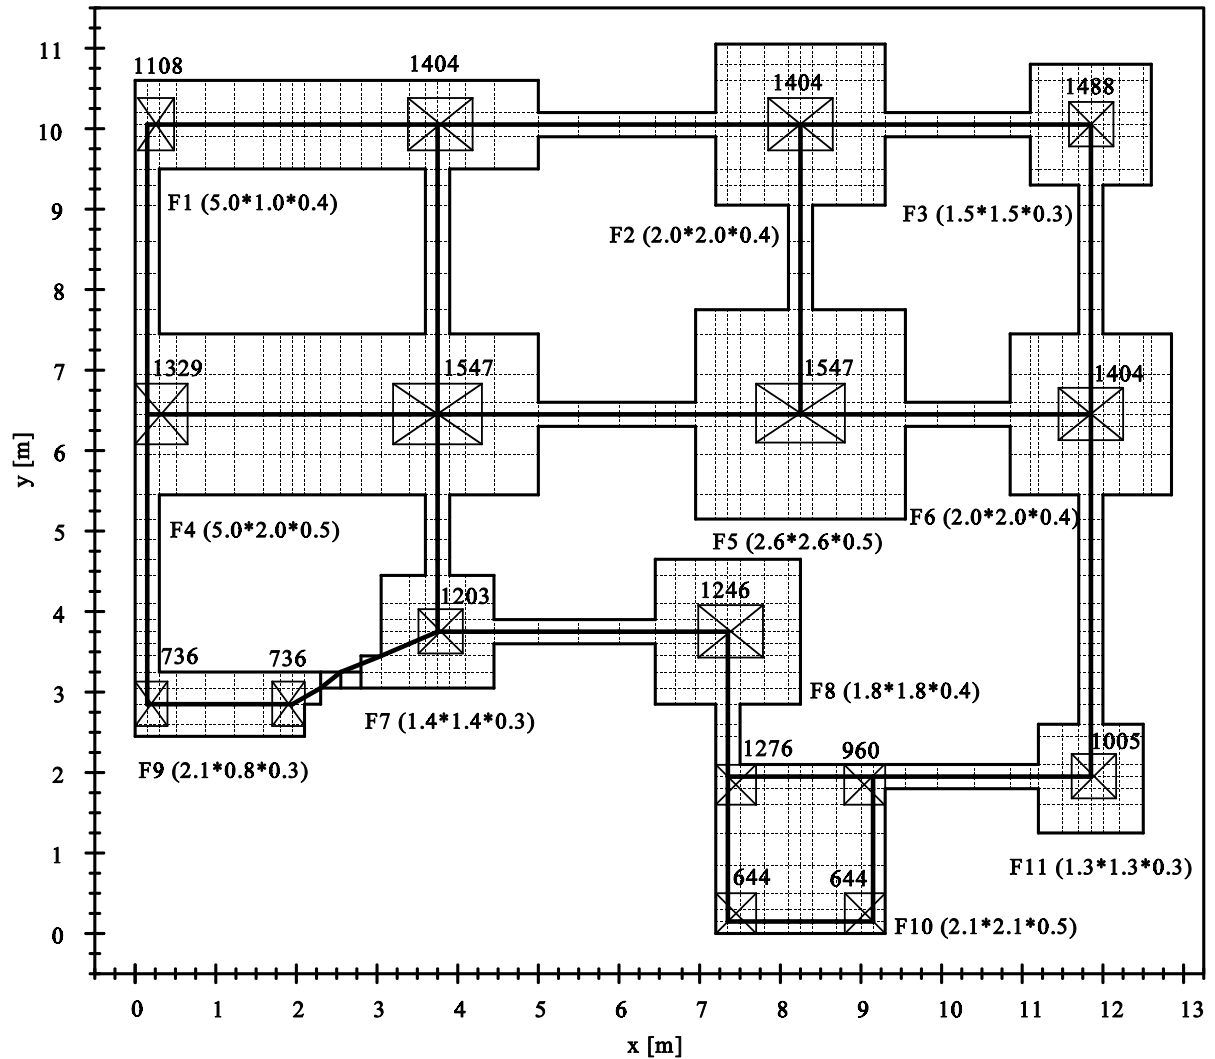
FE-Net of footings with tie beams, loads [kN/m²] and footing dimensions [m]
